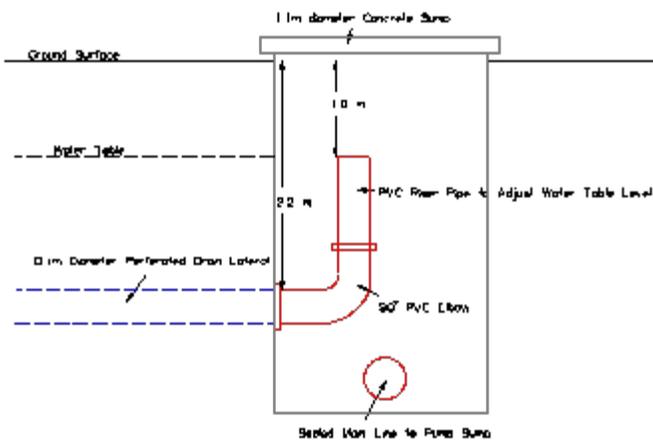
Cross-section of PVC pipe riser used as a weir for controlling flow and water tables
